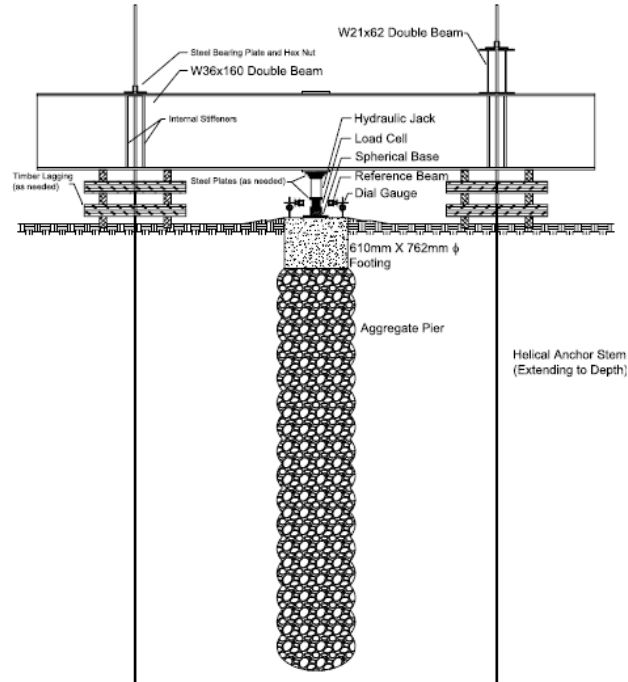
Sketch of the small footing setup on single stone column (after Stuedlein et al. 2012b).
